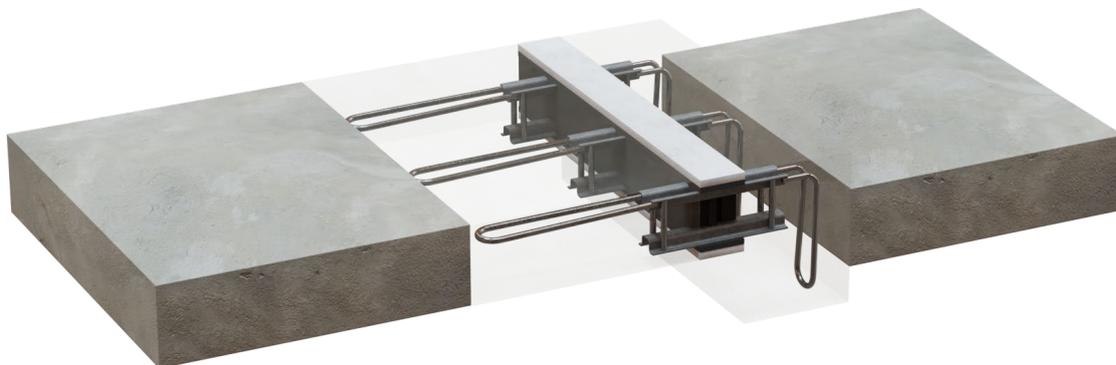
TIPOMEGA® connector anchored in the beam using UD3-shaped bars, welded to the upper profile and bent downwards
